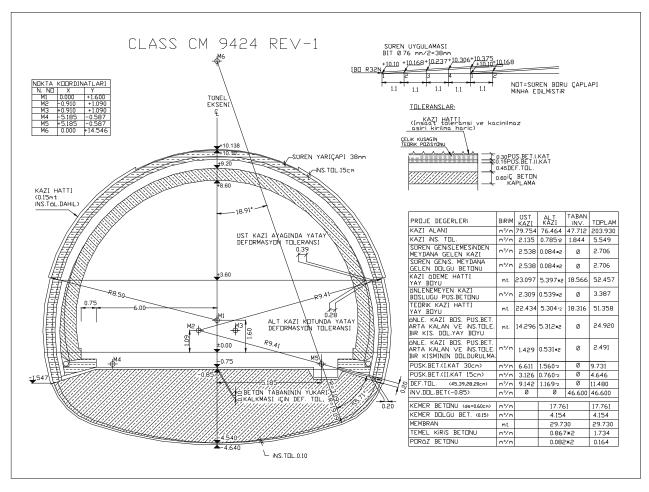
DETAILED CONSTRUCTION DRAWINGS OF TUNNELS
